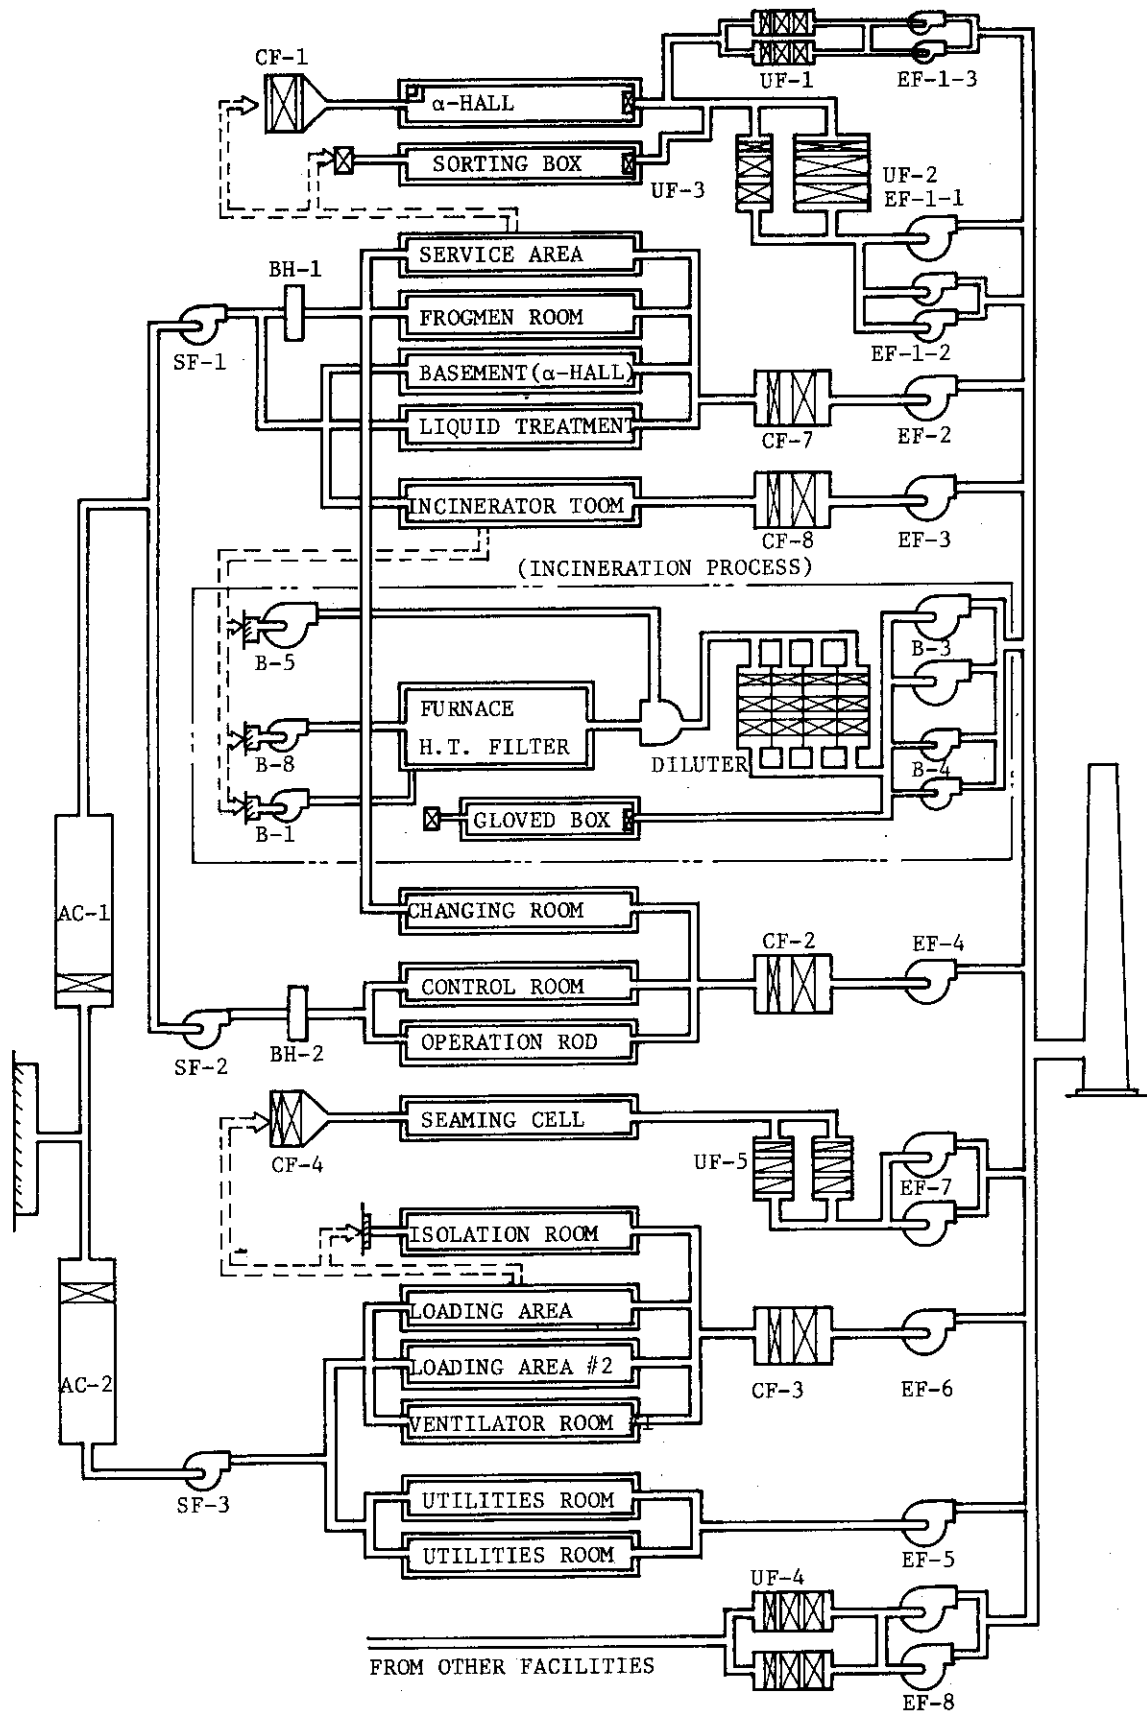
Ventilation scheme of α -treating building.
